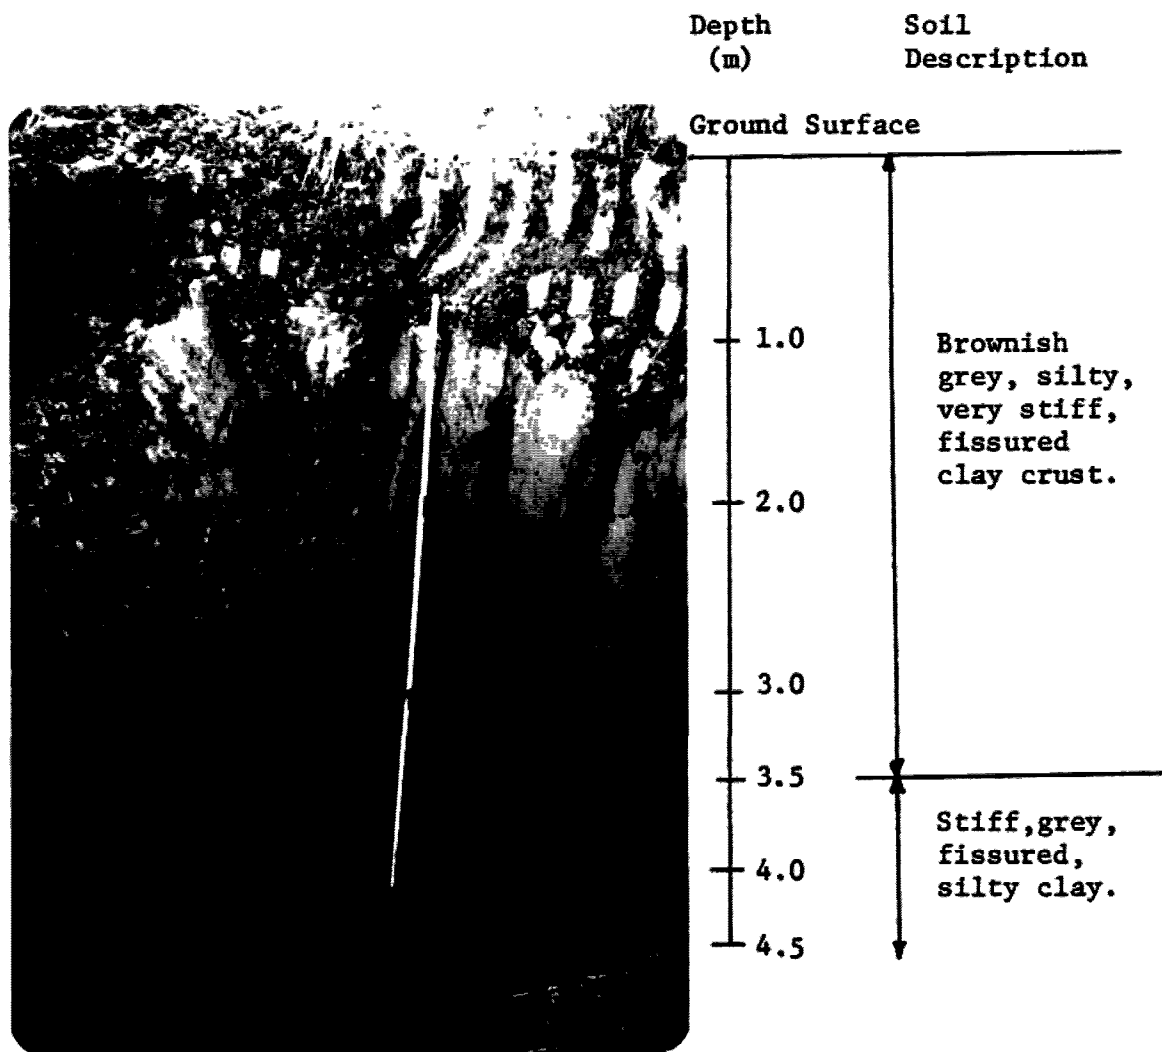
4.5 m deep excavation at Site No. 3, near Green Creek.
